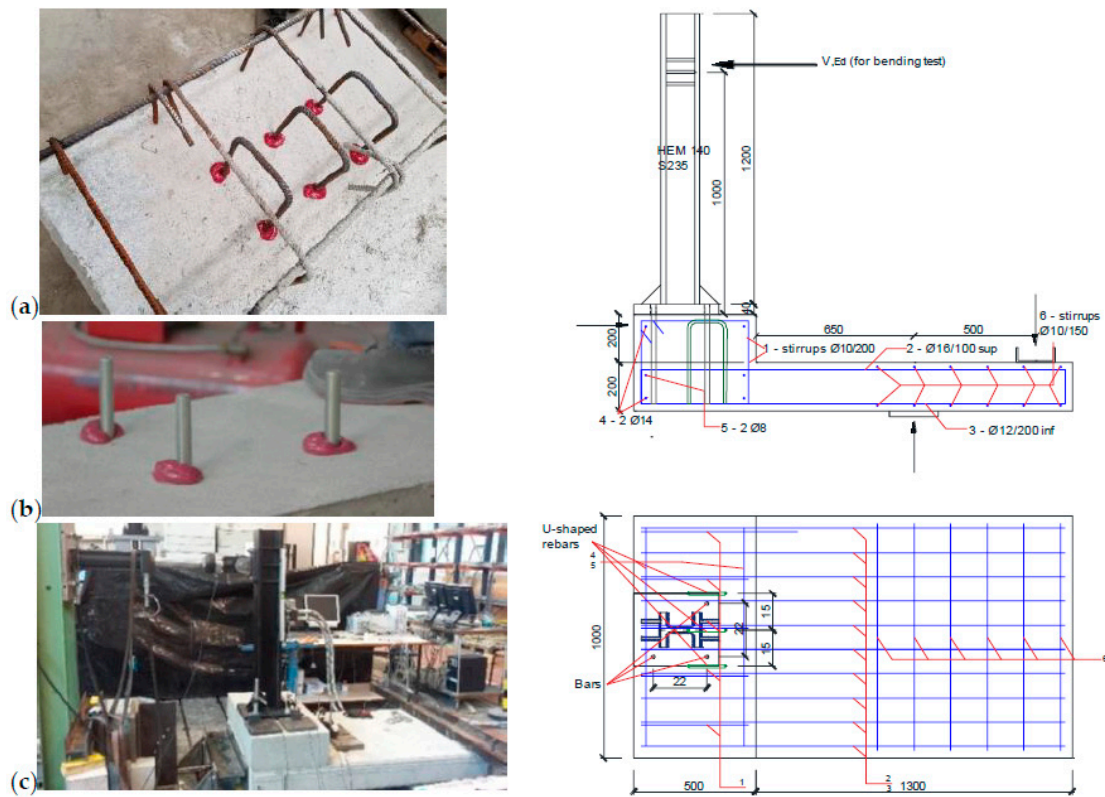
(a) U-shaped rebar installation, (b) bar installation, (c) test setup (measures in mm).
